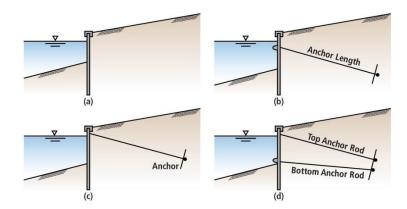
Anchorage Schemes for a Sheet Pile Bulkhead
